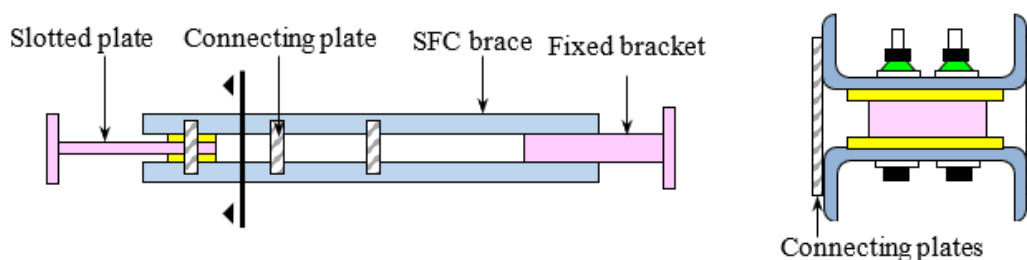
Connecting plates to restrict out-of-plane deflections of the bracing members
